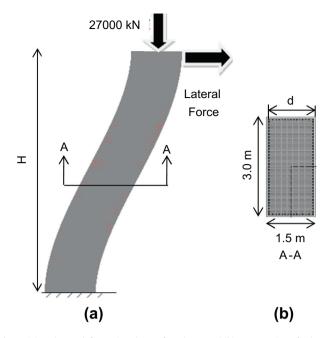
(a) Pushover deformation shape of a column and (b) cross section of column.
